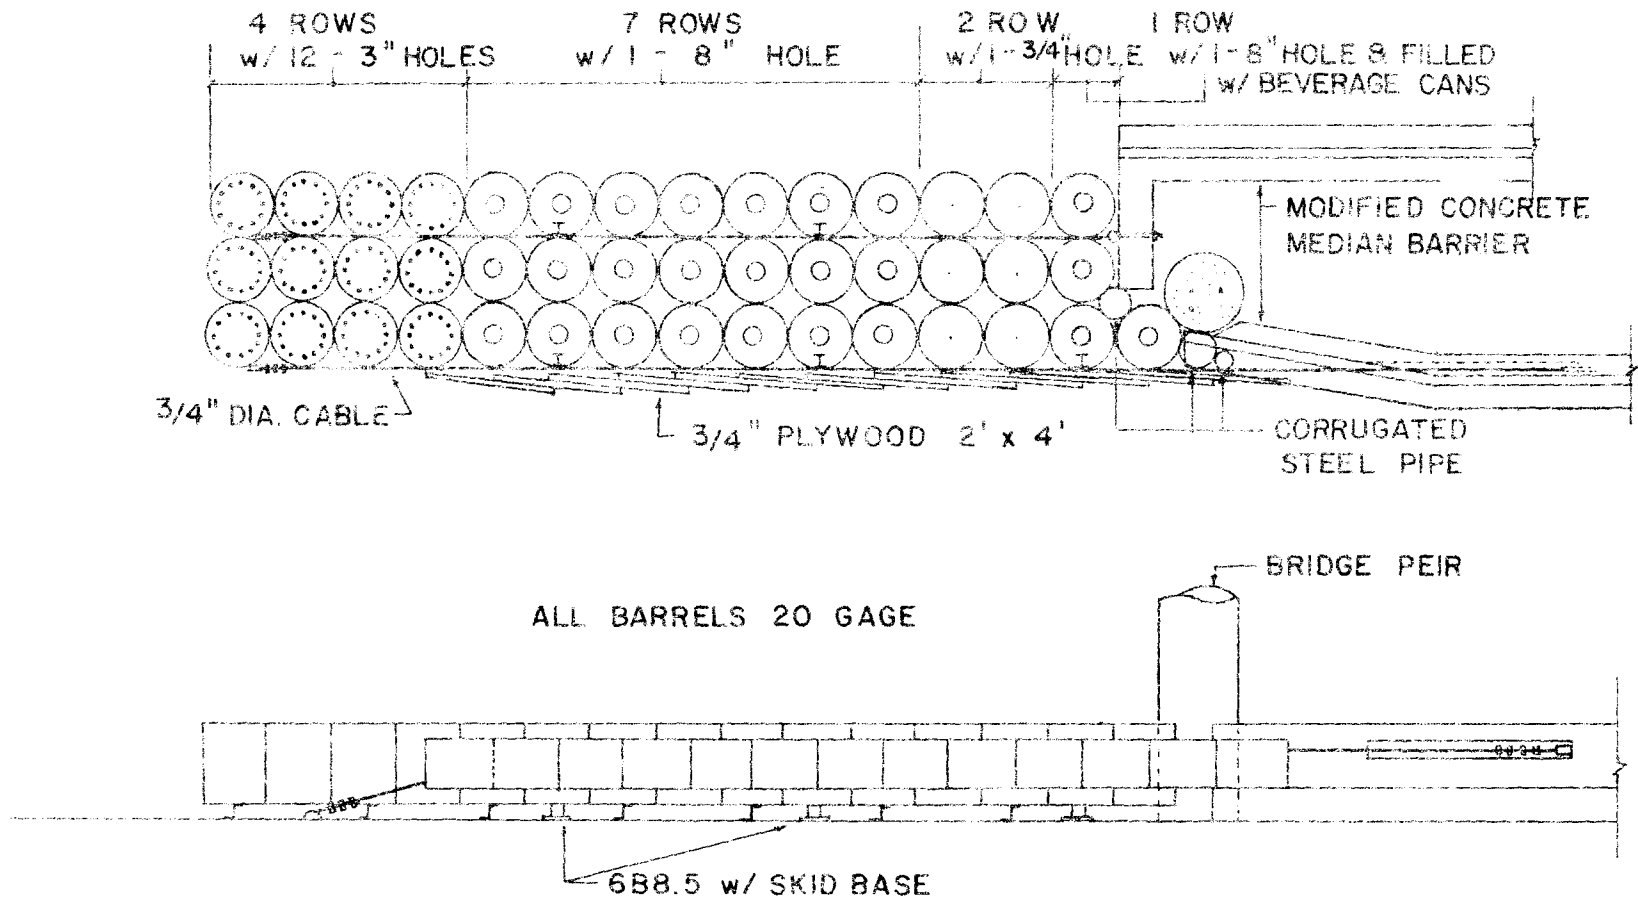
PLAN AND ELEVATION OF POLYMODULAR CRASH CUSHION⁷
